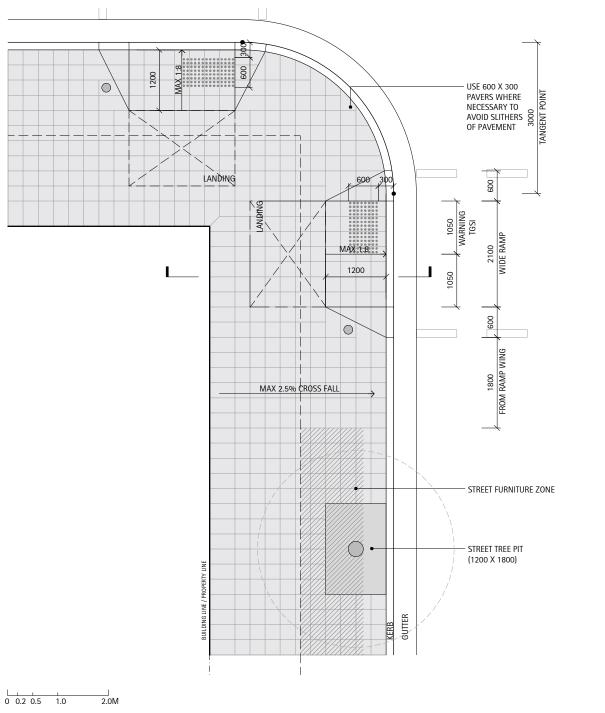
Streets Corner Plan: 3000 Radius 2100 Ramp
